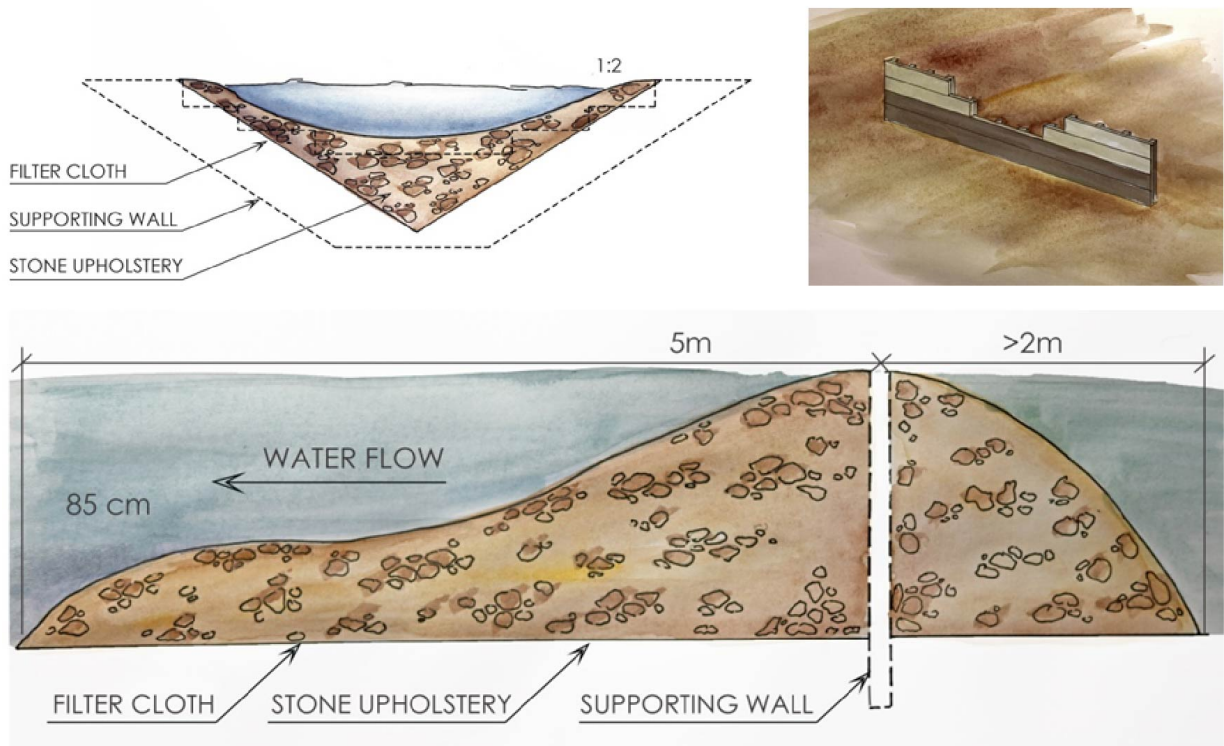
A cross-section in scale 1:2 (above, left) and longitudinal cross-section (below) of a bottom dam and the supporting wall before the stone upholstery is piled around it (above, right). Figures by Ilze Pauliņa.
